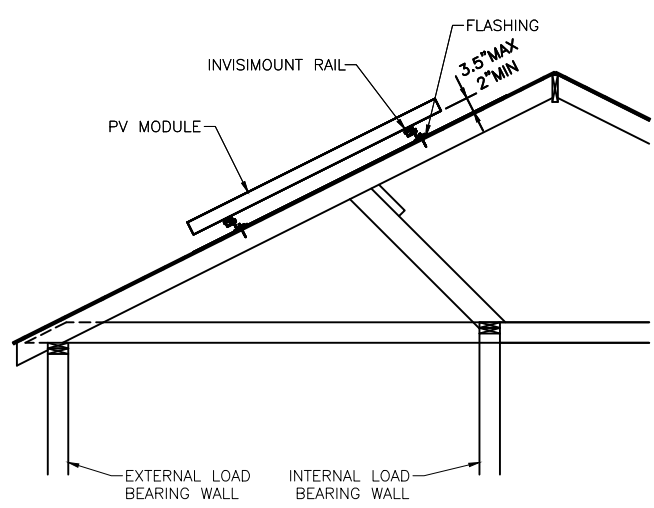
INVISIMOUNT ROOF ATTACHMENT DETAILS @ TRUSS / RAFTERS
